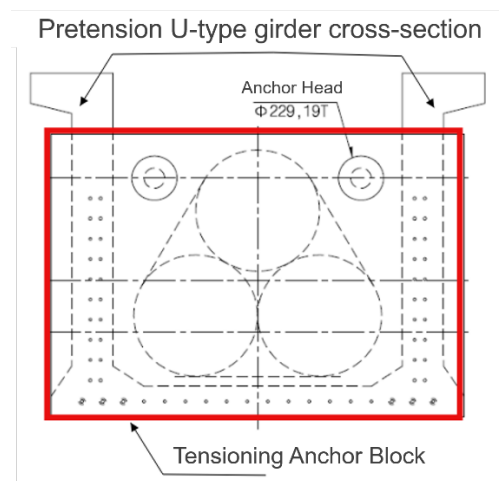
Cross section of pre-tension U-type girder and anchorage block for tension
